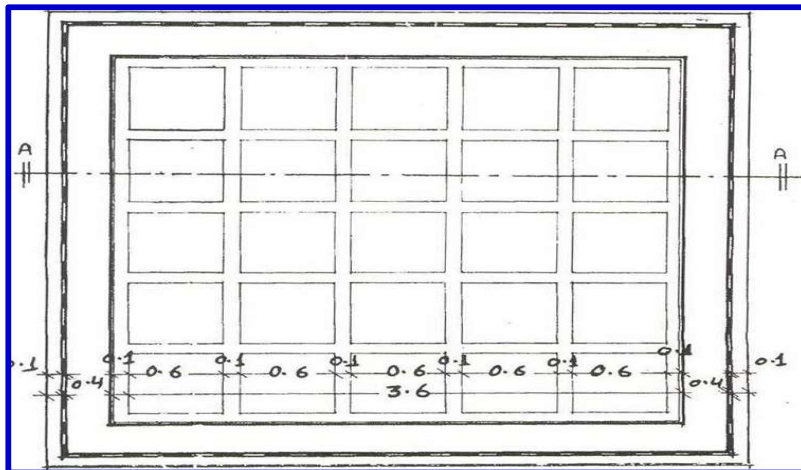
The layout sketch of the floor layer in the rectangular underground pit
